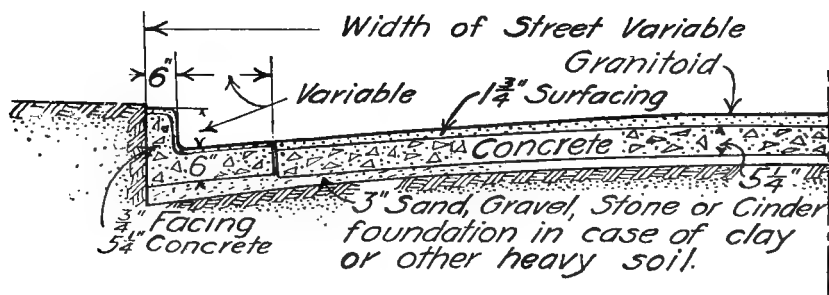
STANDARD SECTION BLOME CO. PATENTED GRANITOID PAVEMENT.
